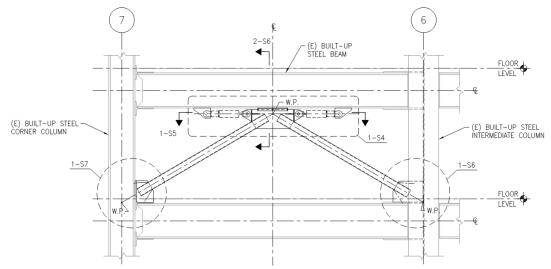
Typical frame elevation of S3: *Laboratory Damper Frame* retrofit. Four total similar frame bays occur at each level of each laboratory building.
